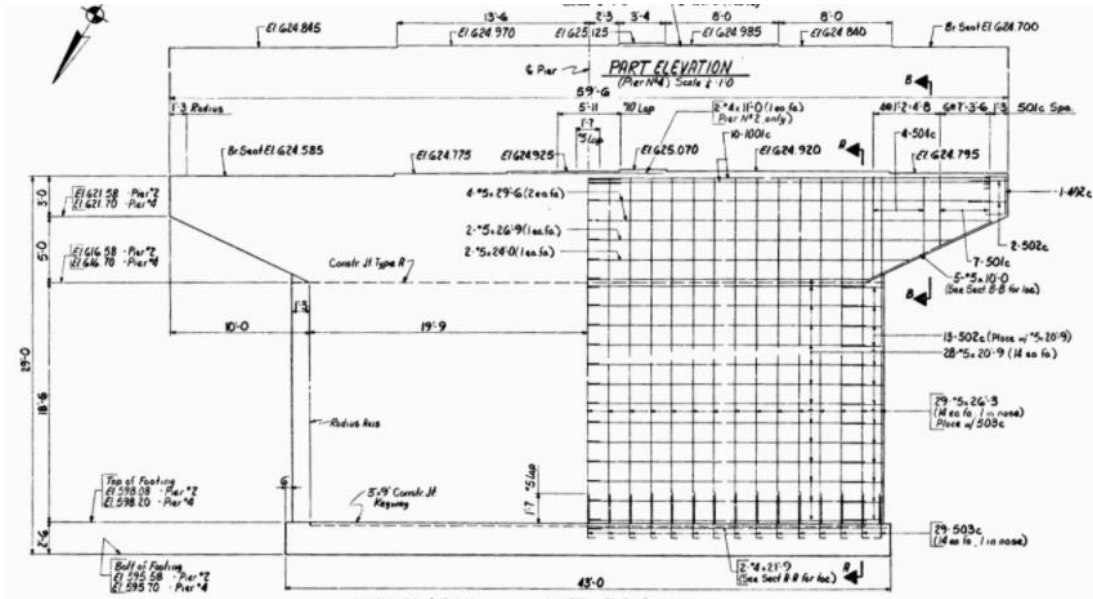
Typical Elevation of Piers of Structure 052-24-06649 (NBI 19430) (INDOT, 1982)
